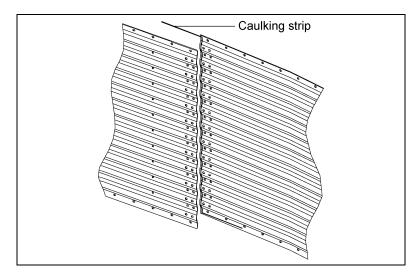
D Standard Sidewall Sheets (As Viewed from Inside the Bin)
